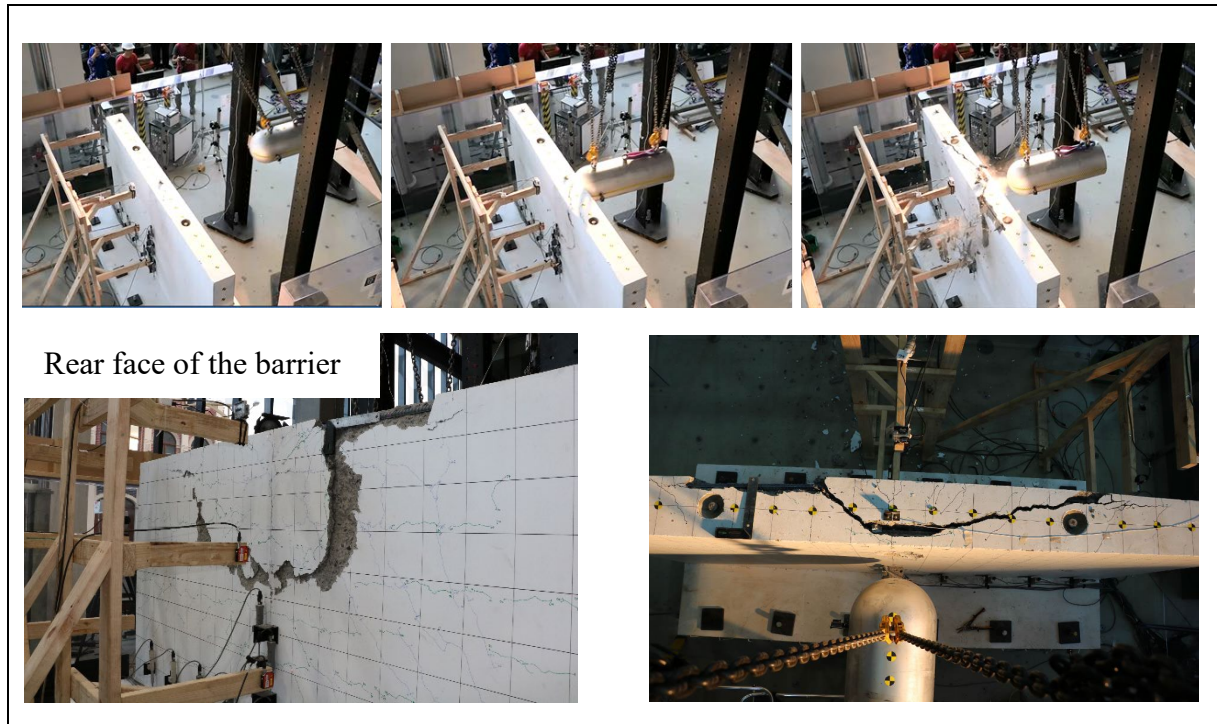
Destructive Impact Test No. D1 (Top: Snapshot of Destructive Impact Test; Bottom: Localised Structural Damage)
